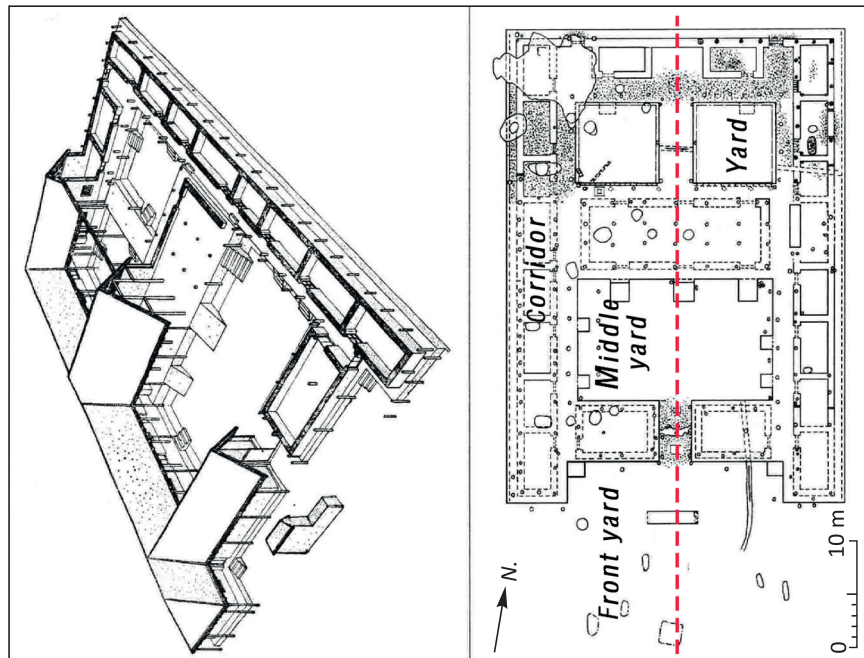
Base site plan and restoration diagram of large rammed buildings platform in Feng Chu
